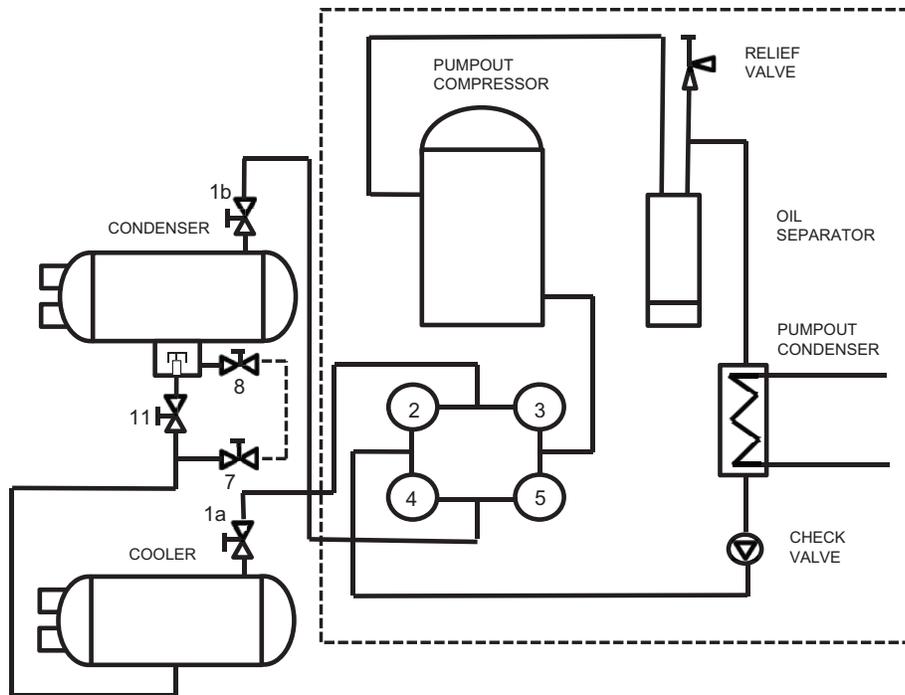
Typical Optional Pumpout System Piping Schematic without Storage Tank
